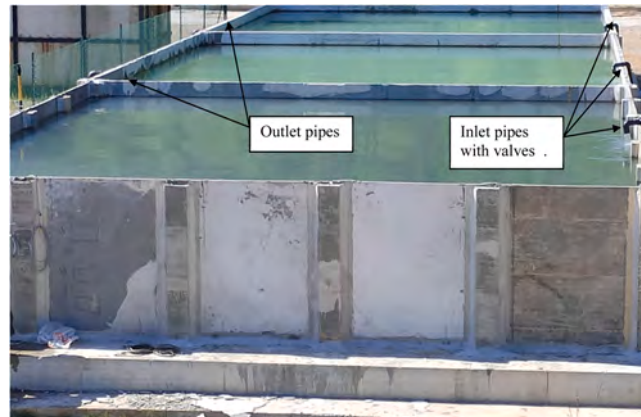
The basin is completed and filled with geothermal water in its three compartments in its design structural service scenario (in forefront the buttress columns stiffening and connecting the 30 mm precast UHDC slabs are evident).
